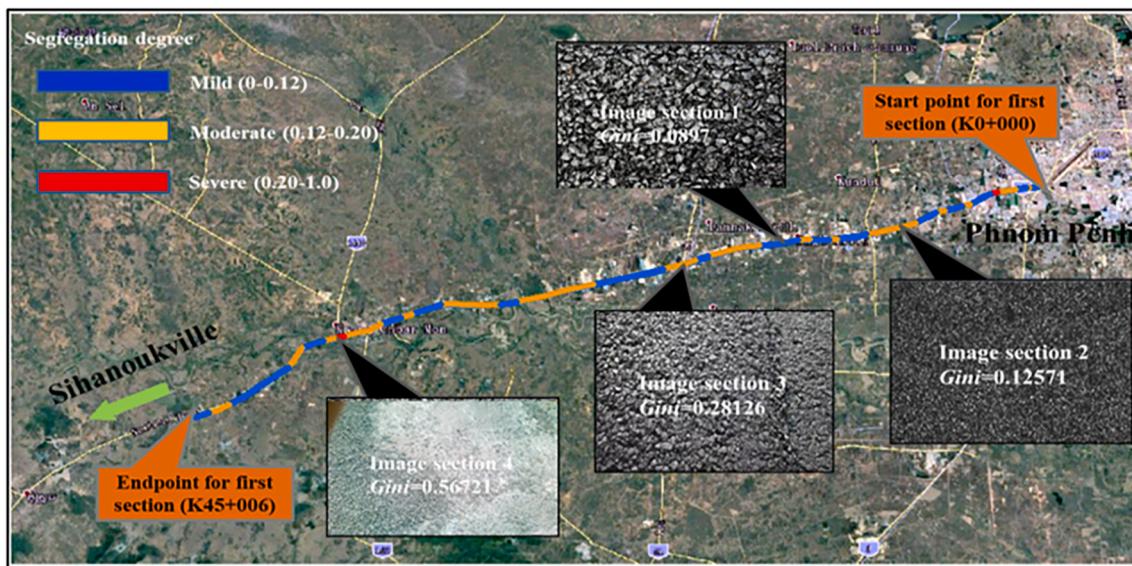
Real-time monitoring of paving quality of asphalt pavement construction in Phnom Penh to Sihanoukville highway project [5].
